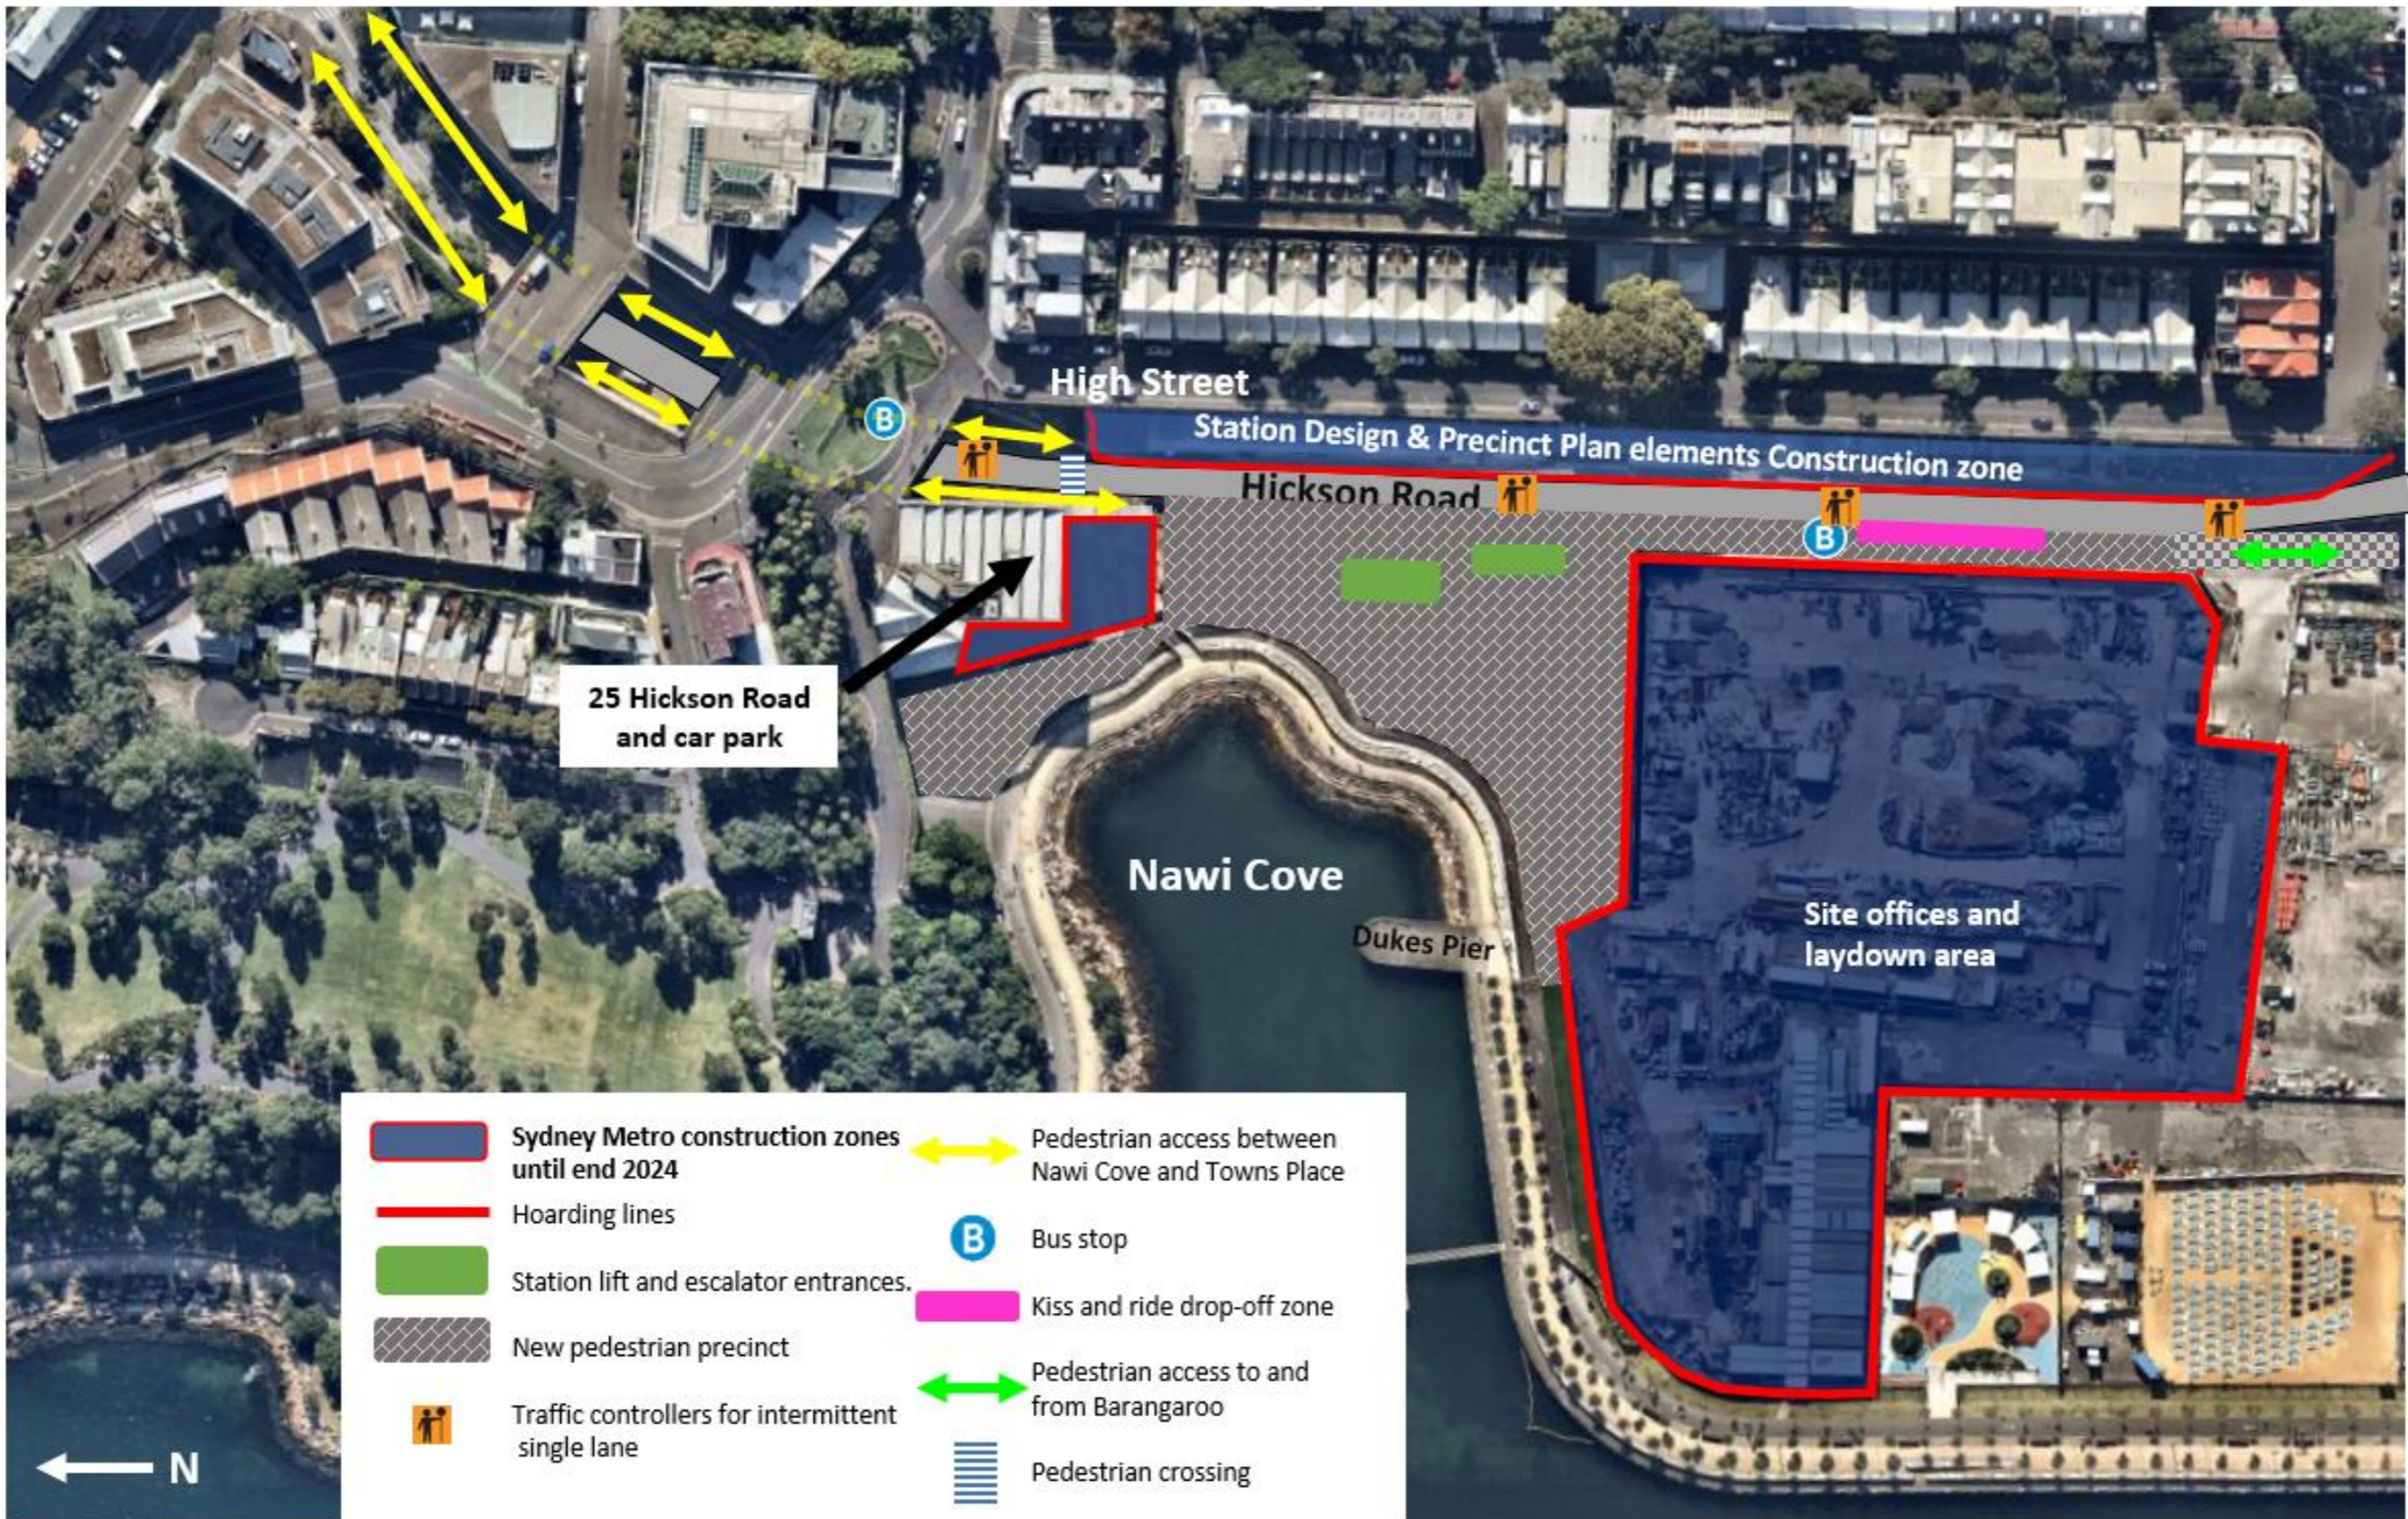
Pedestrian Management around Barangaroo Station construction works after Metro City Operations Commencement to end Q4 2024
